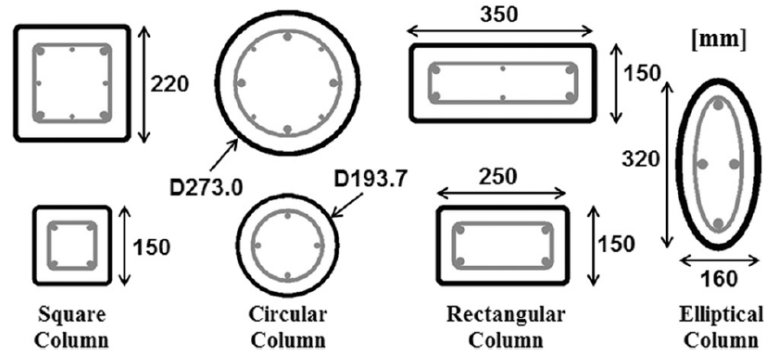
Scheme of the cross-sections of the tested columns [26]
